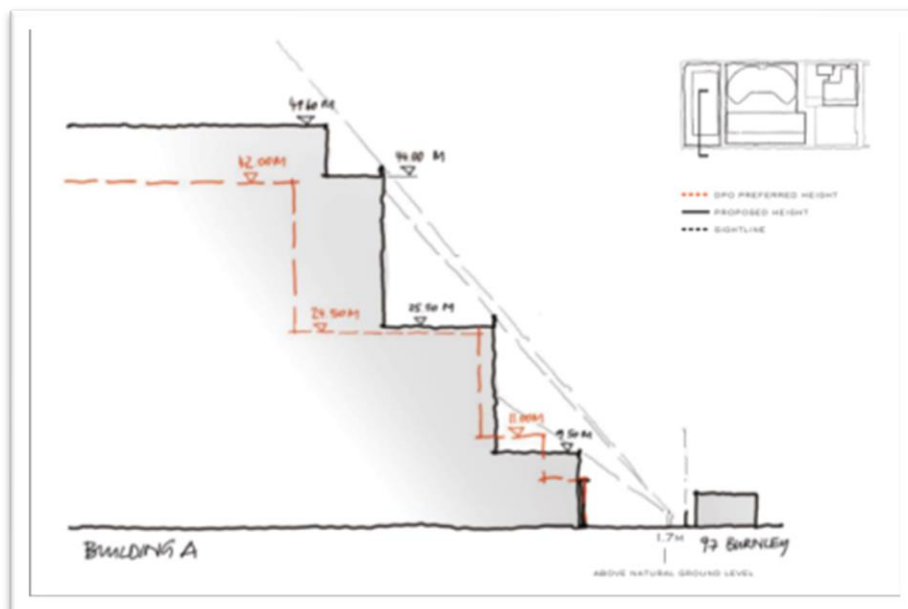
Sightline of Building A from Burnley Street. Source: Development Plan (Gurner 2023)
